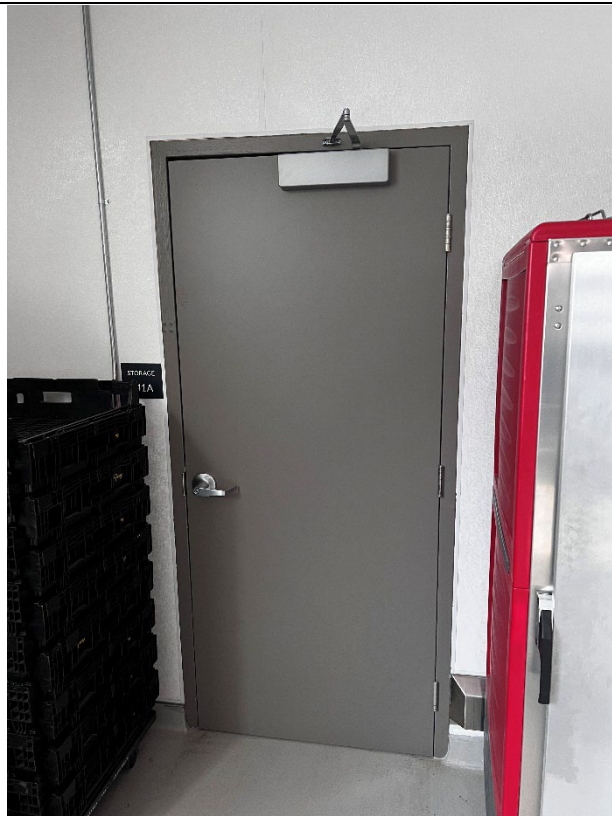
| View of basement storage area floor, facing towards doorway that leads to eastern crawl space, facing southeast.
